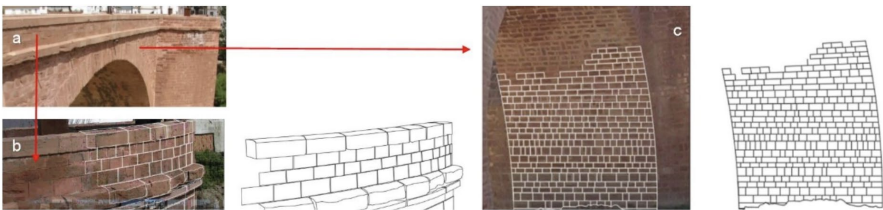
Upper and lower masonry stone system in Las Donadas Bridge, Montoro, Spain. Source (Garcia 2008) (Author 2020)
